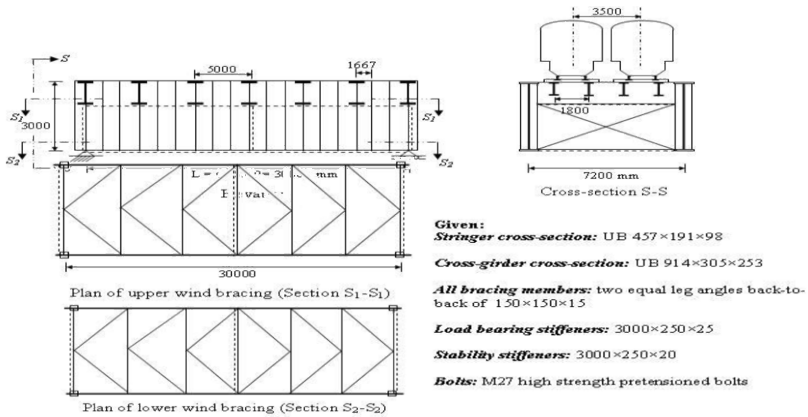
General layout of a double track open-timber floor plate girder railway deck steel bridge.
